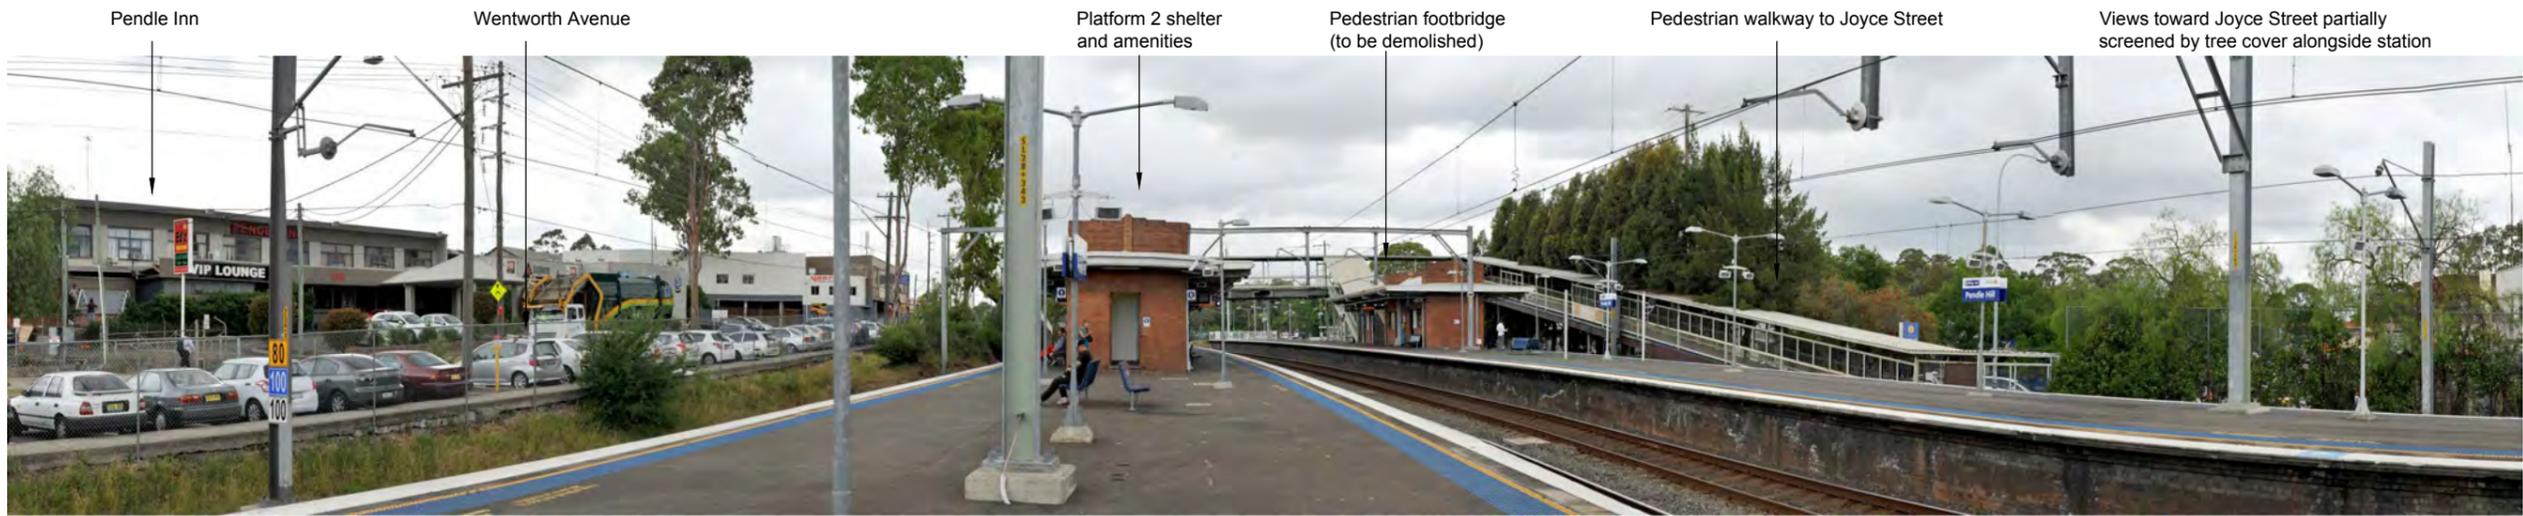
View south east from Platform 2 toward walkway and footbridge access from Joyce Street and Wentworth Avenue
